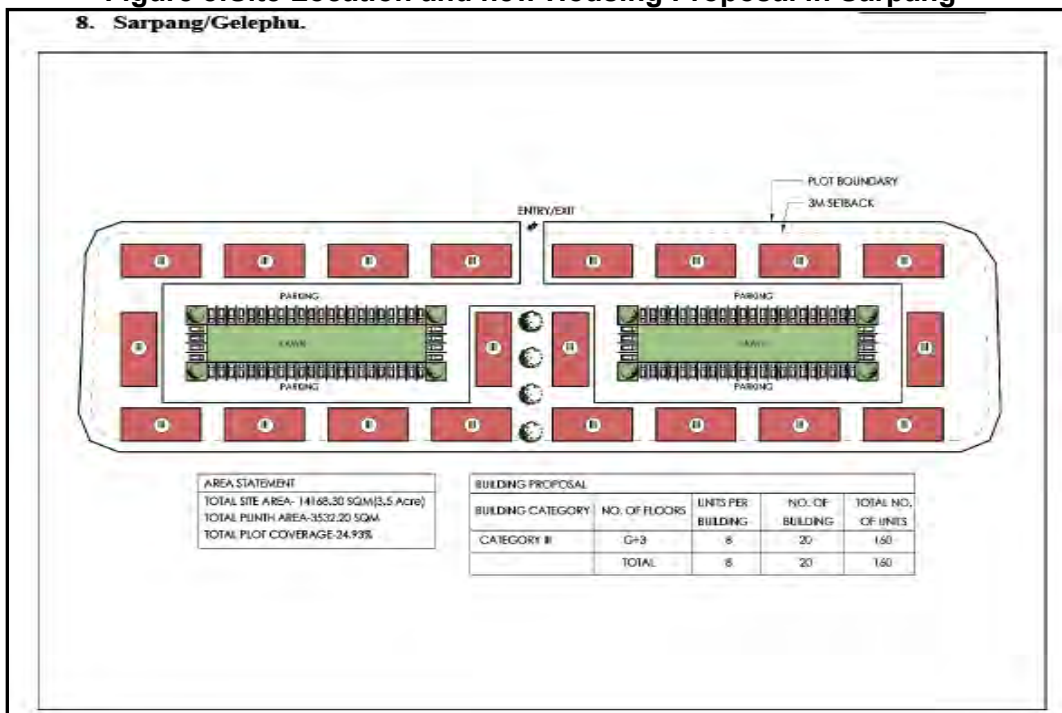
Site Location and new Housing Proposal in Sarpang¹⁵
